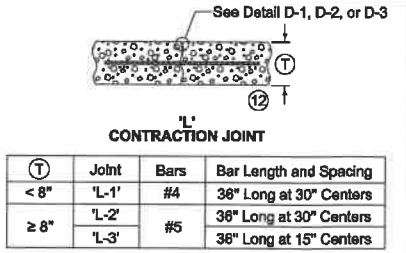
STANDARD ROAD PLAN PV-101 SHEET 2 OF 8
